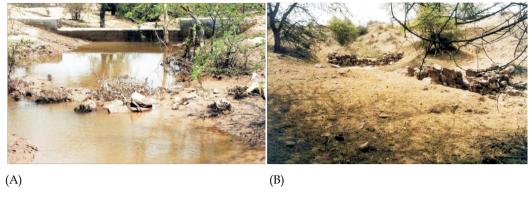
Check dam made from (A) masonry work and (B) loose stones (Source: Ref. 8).
